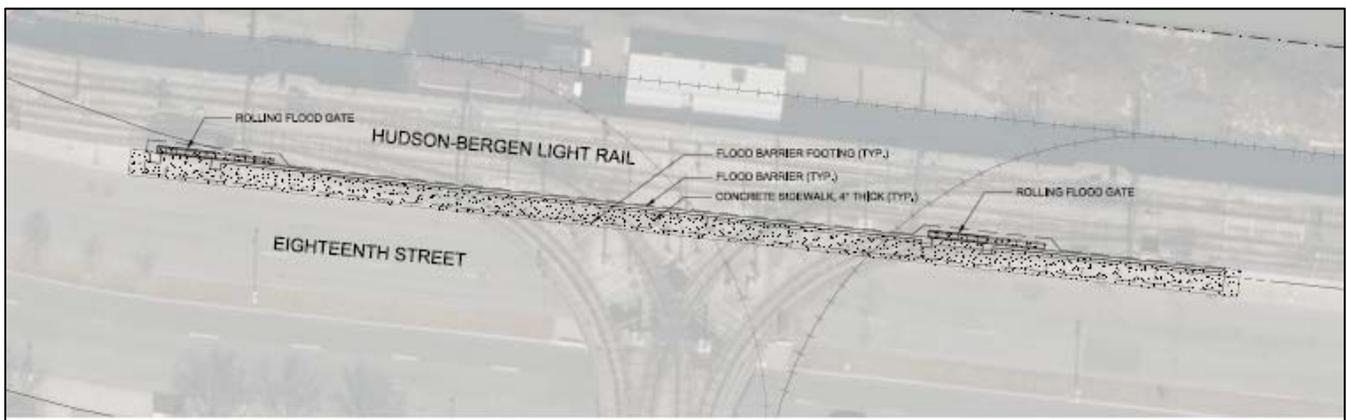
18th Street at NJ TRANSIT Tracks Flood Gate
